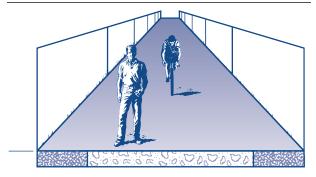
Adding a Railing to a Concrete Barrier
